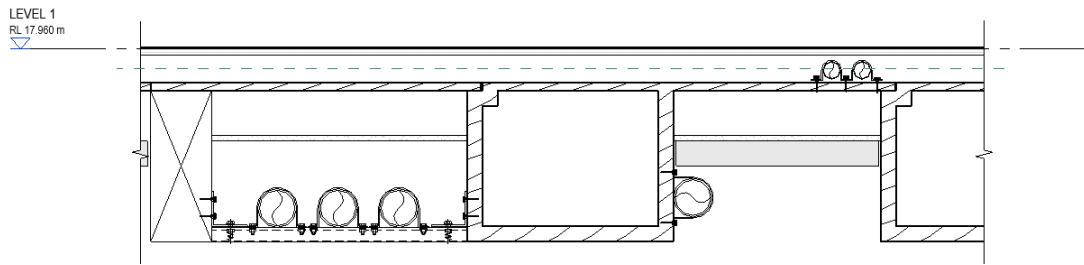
Example detail to minimise the visibility of services and their restraint to Potius flooring.
